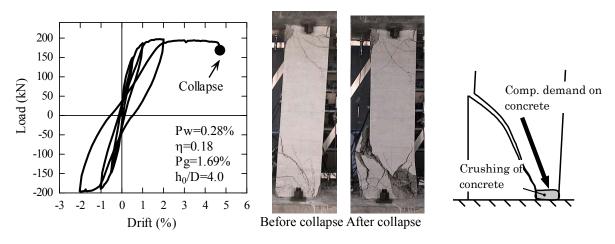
Collapse of F-mode specimen (Specimen Y28L)
